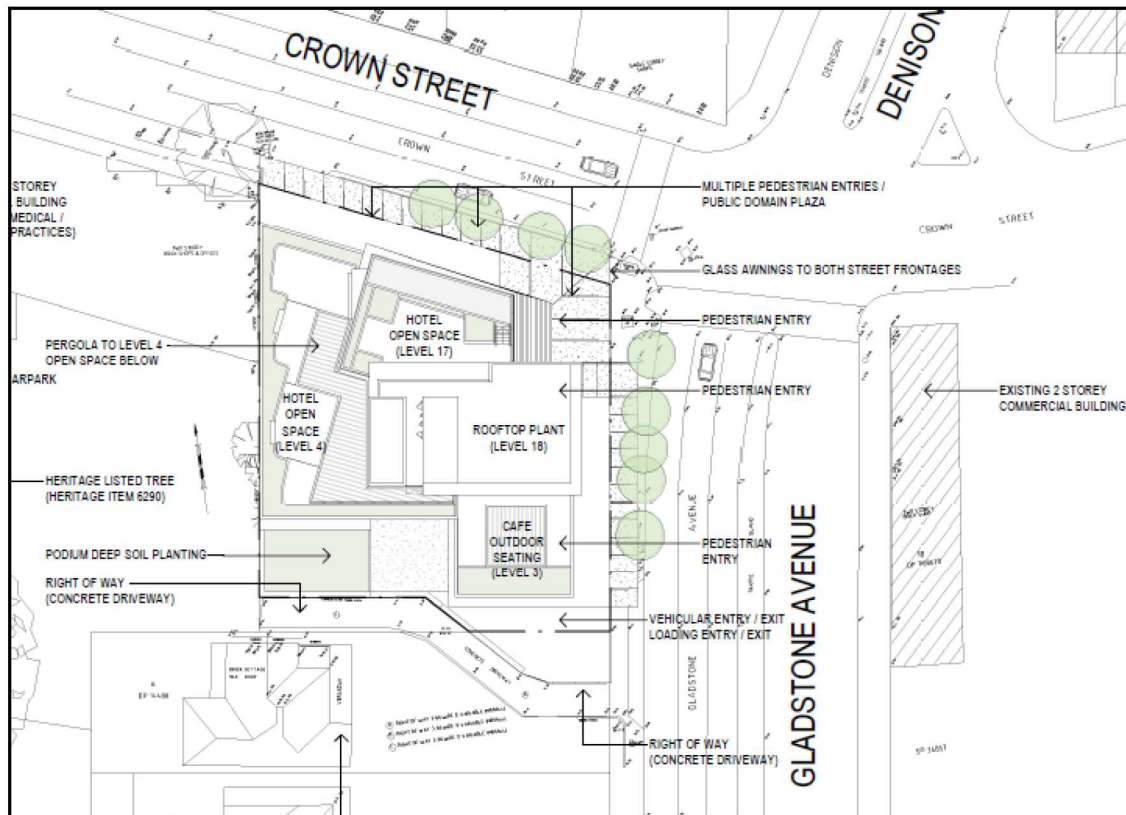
Proposed Site and Lower Ground 1 Floor Plan (*Source: DWA)
